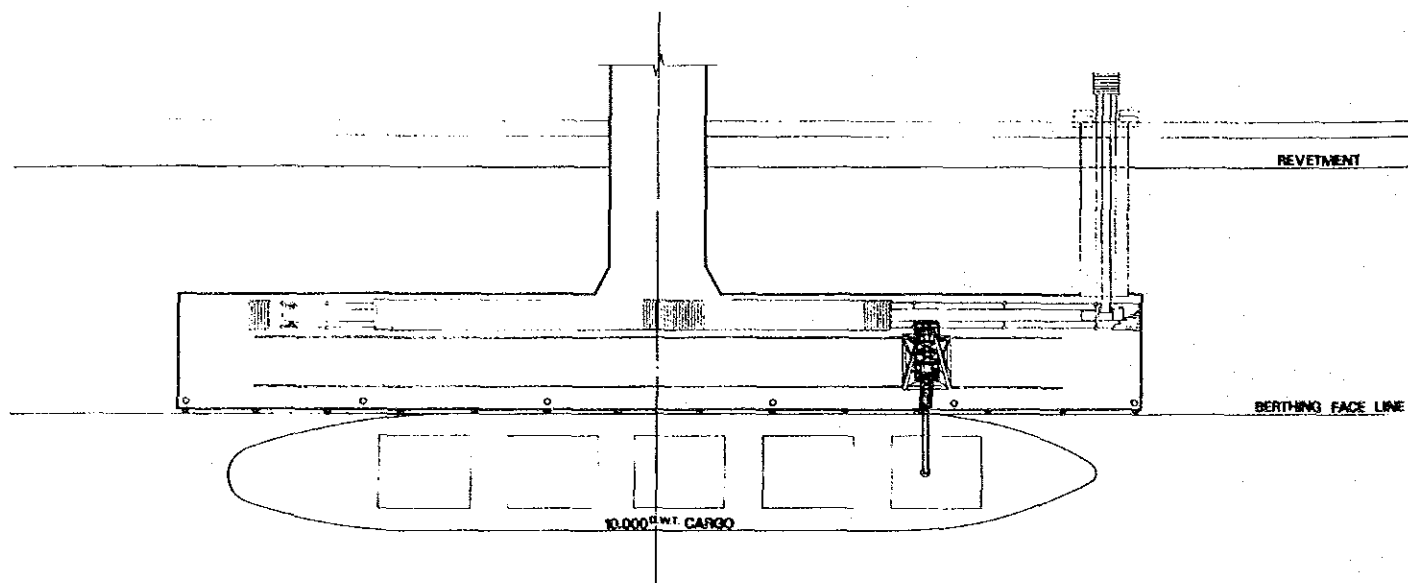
GENERAL PLAN OF LOADING PIER
